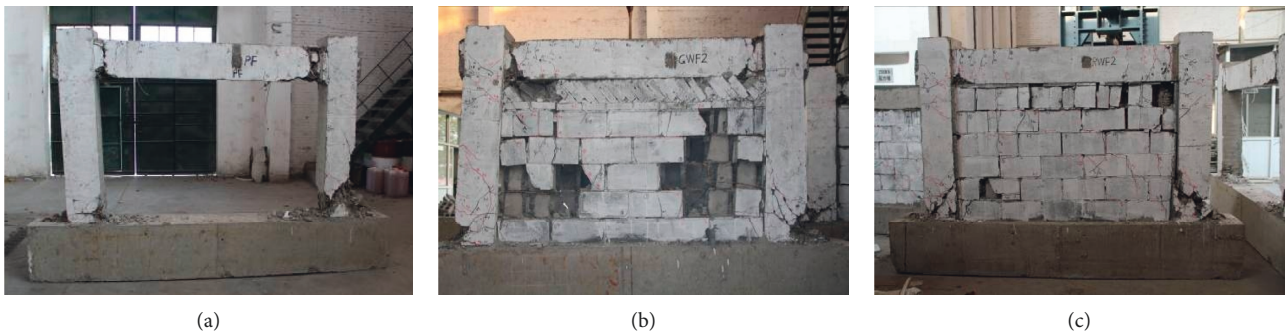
Final failure modes of three specimens provided by reference [11]: (a) bare frame; (b) infilled RC frame with rigid connection; (c) infilled RC frame with flexible connection.
